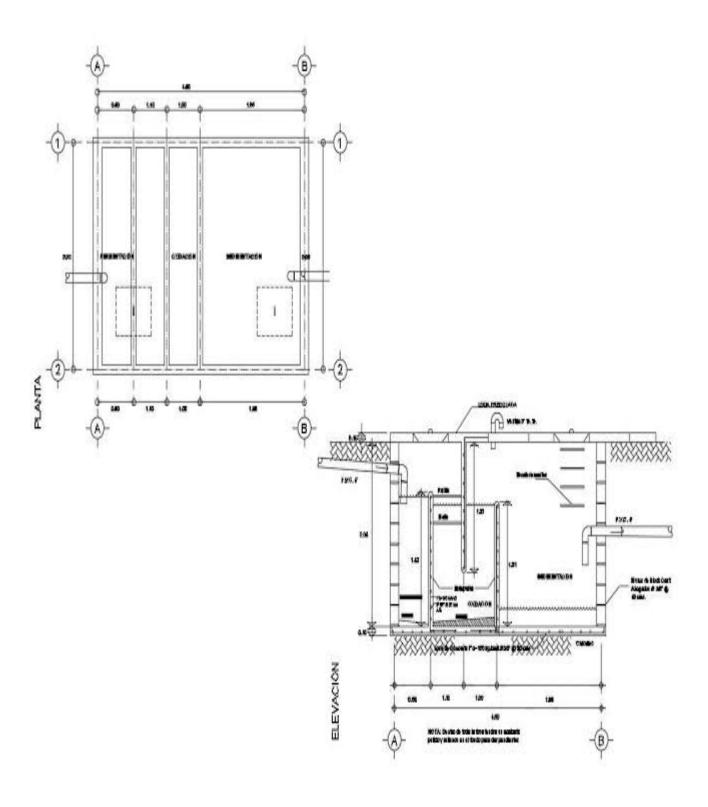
DESIGN OF RAINWATER HARVESTING (PLAN, ELEVATION)
